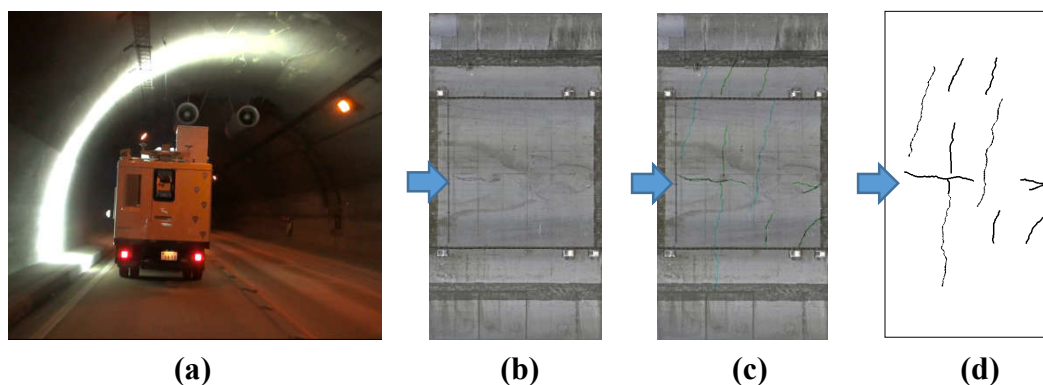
Extraction of cracks on tunnel lining surface: a, field test; b, unfolded crack image; c, identification of cracks; d, extraction of cracks
